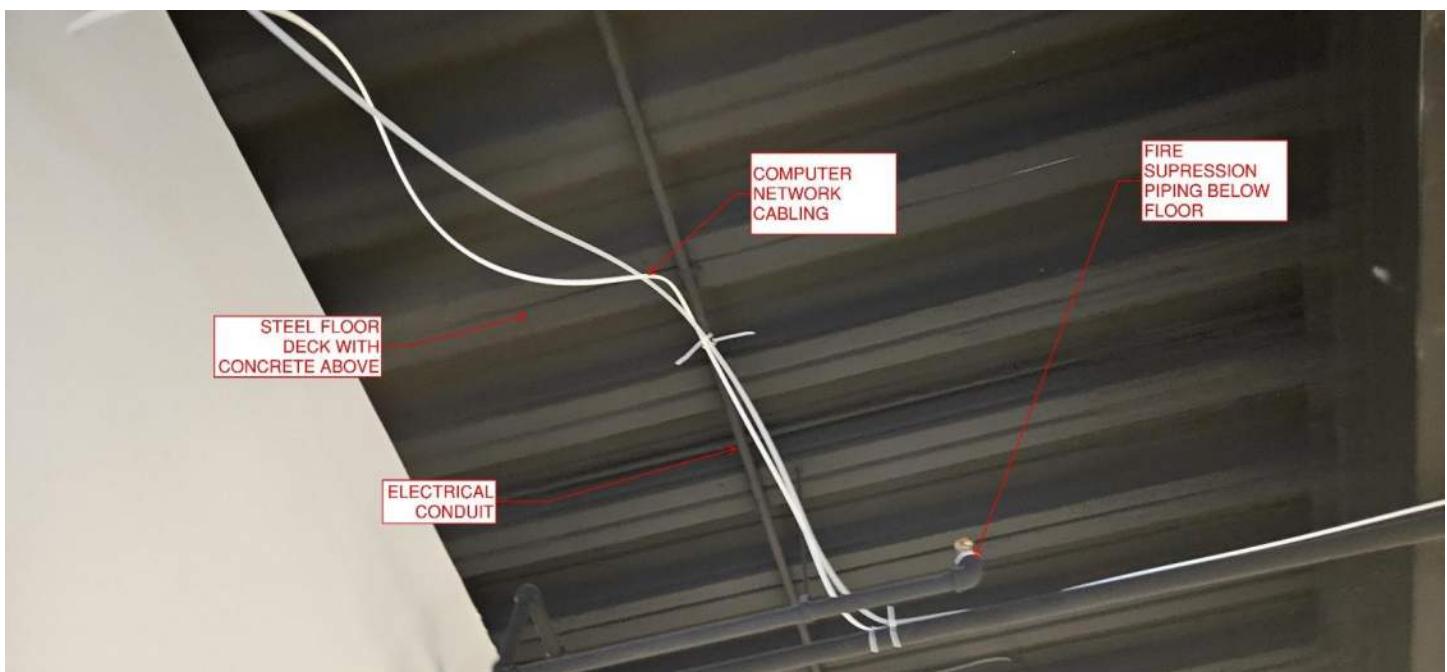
CABLING AND FIRE SUPPRESSION PIPING
